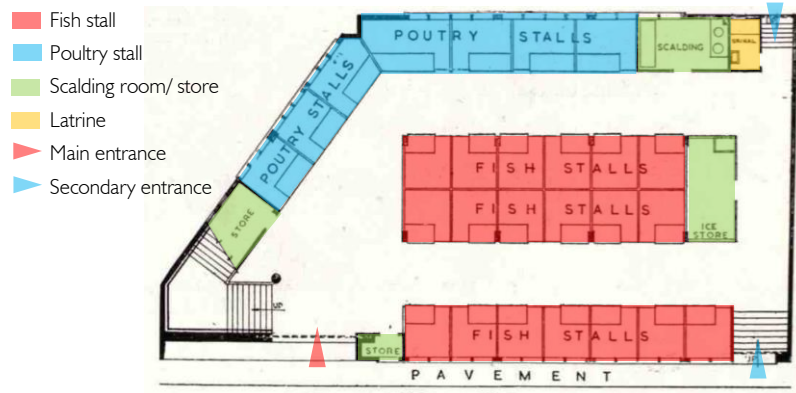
Ground Floor Plan of Bridges Street Market.<sup>301</sup>
